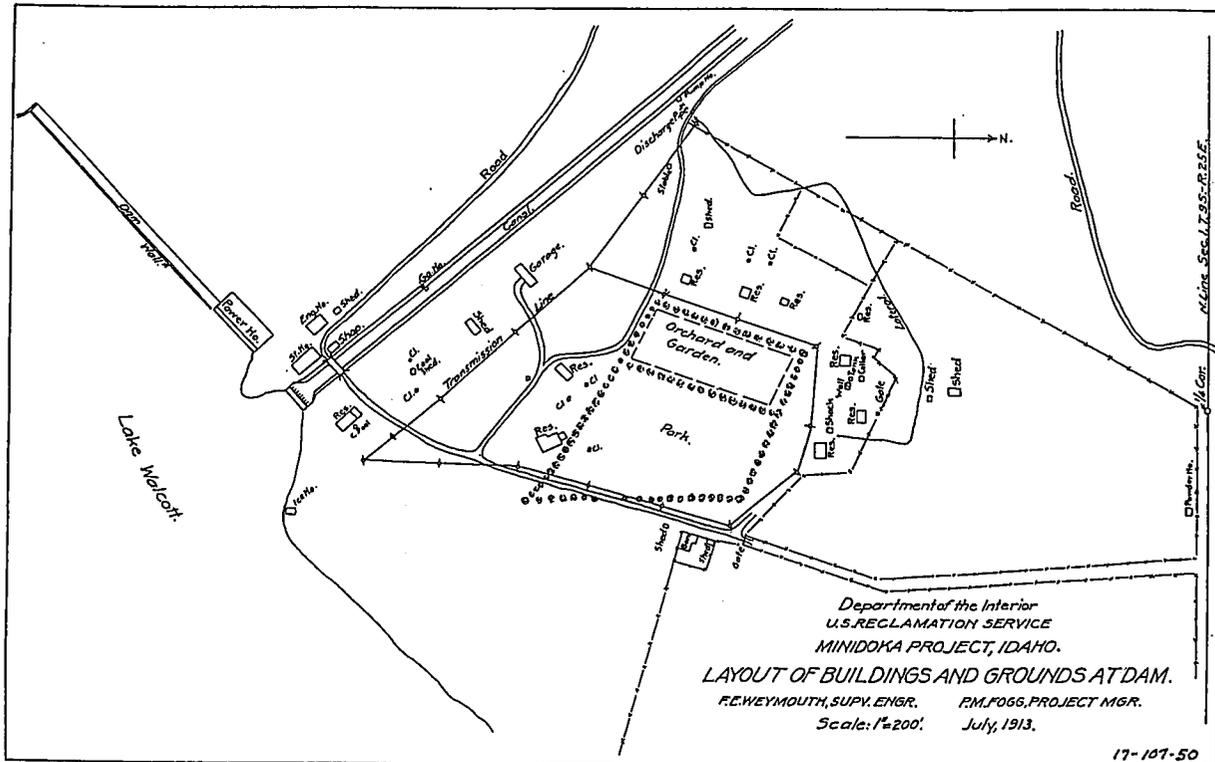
Layout of buildings and grounds at Minidoka Dam, by U.S. Reclamation Service, July 1913.
